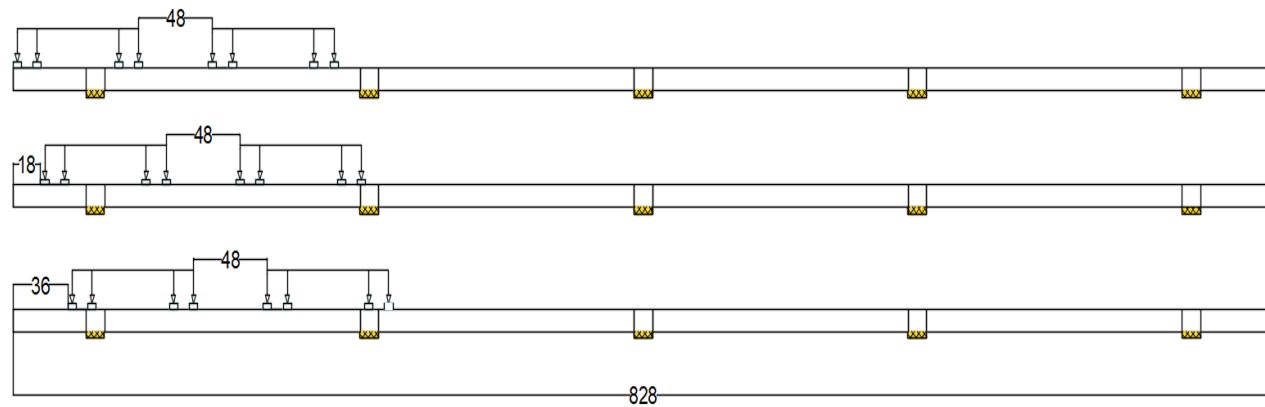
Location of P-15 truck for 15 ft girder spacing deck slab (Case 3, unit: in)
